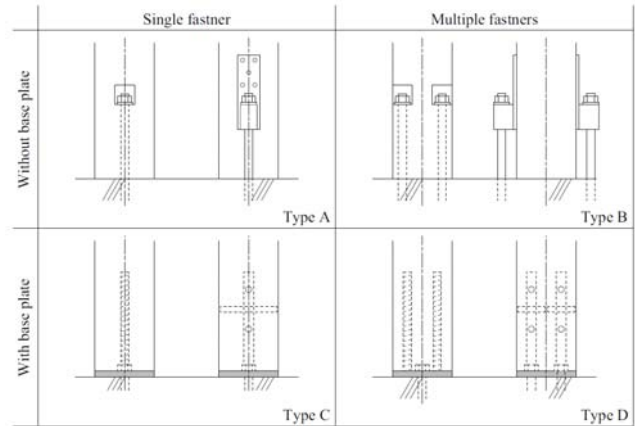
Subdivision of flange type connecting systems used at the bottom of a column in a wall structure
